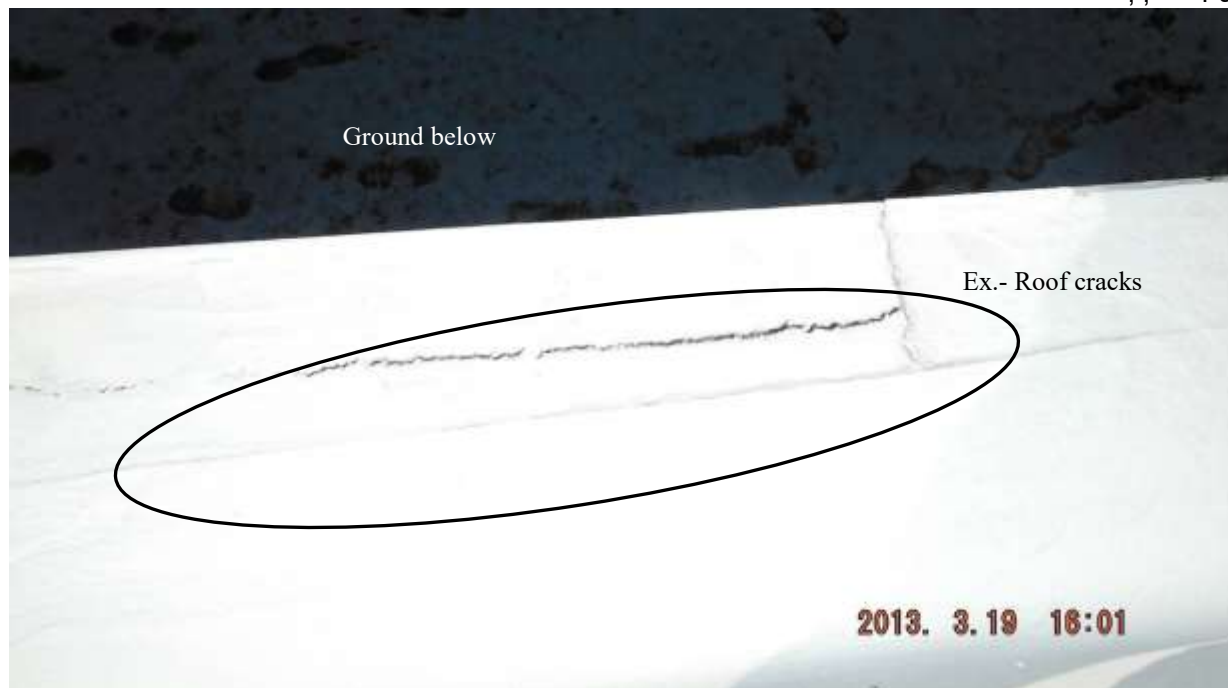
Example of cracks on roof; leaking and poor condition/very old and patched.
